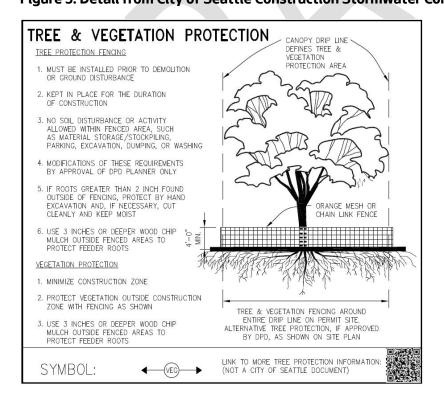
Detail from City of Seattle Construction Stormwater Control Plan
